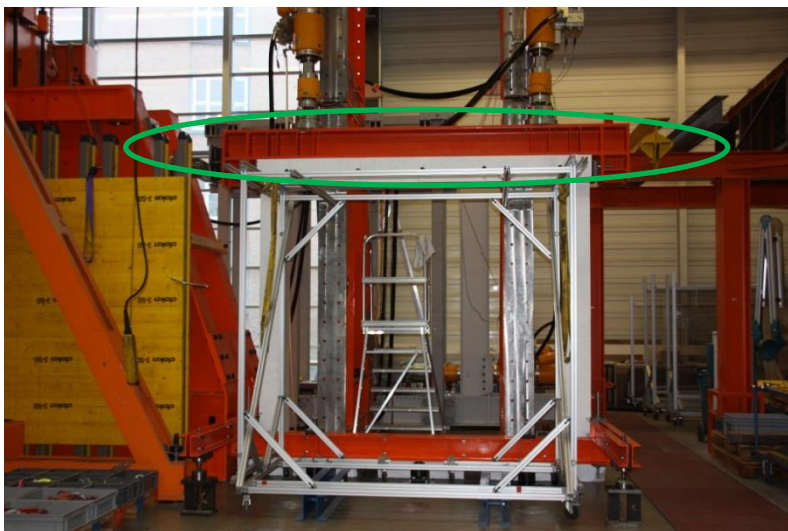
Steel beam for transfer of vertical forces to the columns
